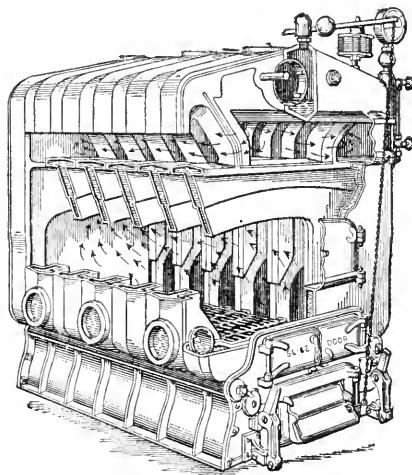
NO. S-36-7 IDEAL STEAM BOILER.
